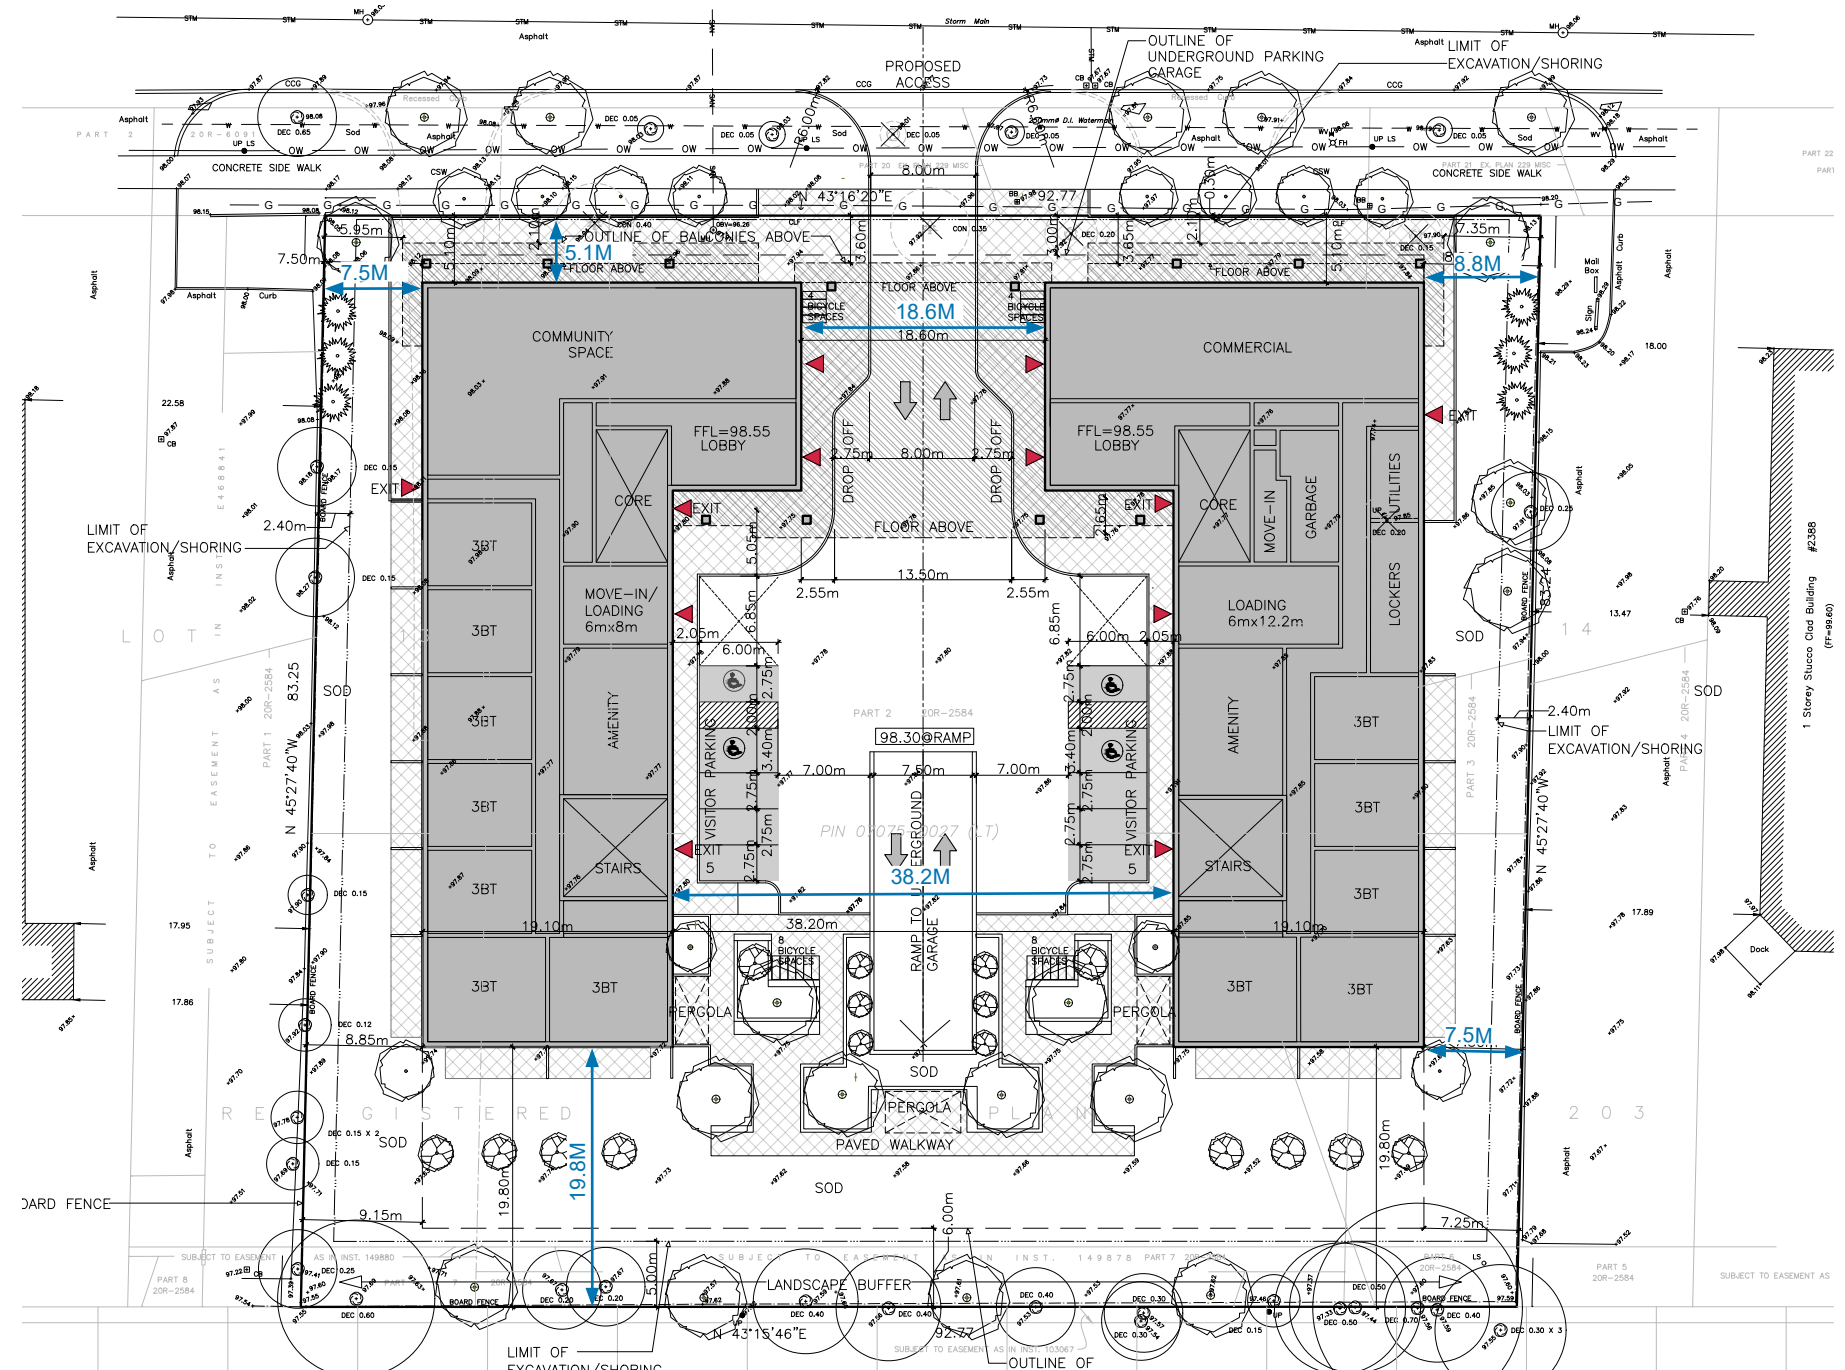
Site Plan - Prepared by Terry Martino Architects and Annotated by Weston Consulting
